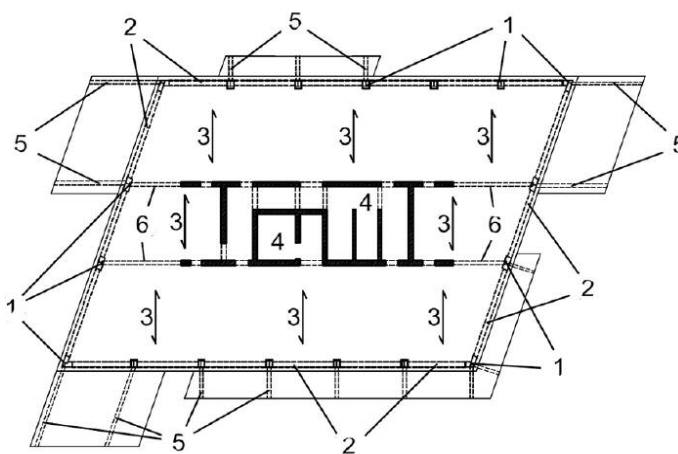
Hyperion building in Bordeaux – floor plan: 1 – timber and steel columns; 2 – timber perimeter beams; 3 – CLT floor slabs; 4 – reinforced concrete core; 5 – steel balcony support beams; 6 – internal steel beams in the line of the core walls
